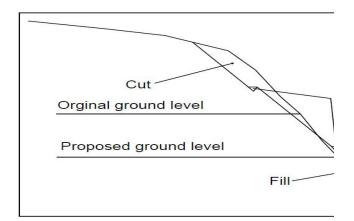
Proposed geometric design for the case slope before applying soil nails.
